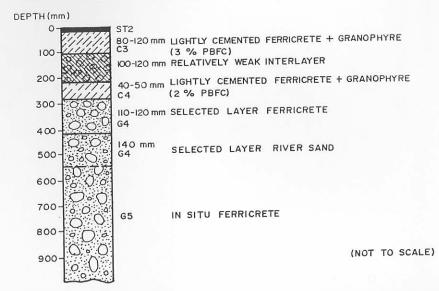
(b) DETAIL OF THE RELATIVELY SHALLOW PAVEMENT STRUCTURE AT THE HVS SITE AT km 12,6, ON ROAD 2212 NEAR BULTFONTEIN
